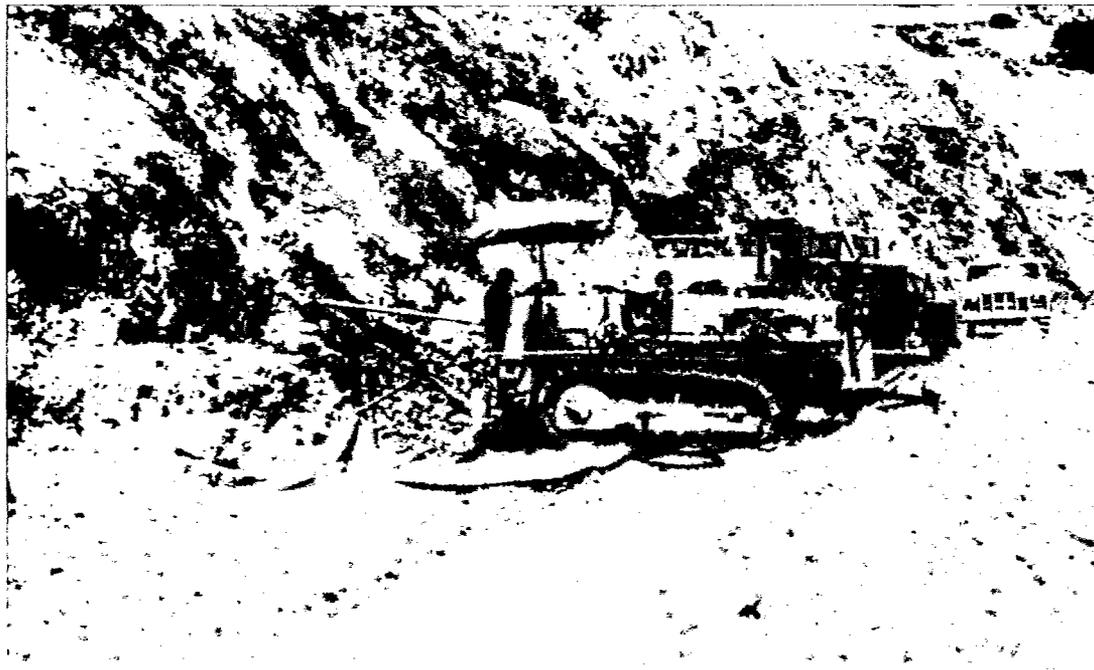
Horizontal drilling machine employed for installation of slope-stabilizing drain system. (A.W. Hatheway)
